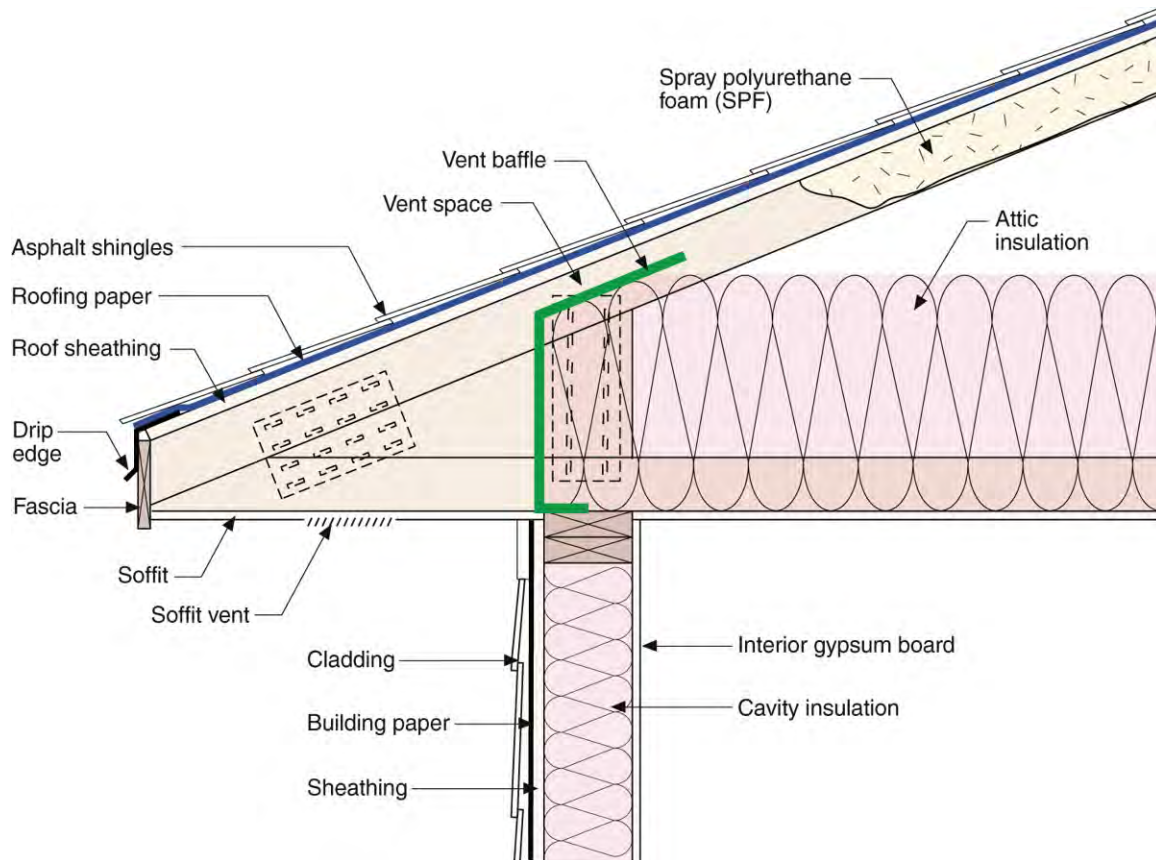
Vented Attic - Asphalt Shingles – Air Impermeable Insulation On Underside of Roof Deck - Can be used in all climate zones. In CEC Zone 16 (IECC Climate Zone 5 or higher) a Class II vapor retarder should be installed at the ceiling plane below the insulation. In all other climate zones a vapor retarder is not required. A ventilation ratio of 1:300 is recommended in all climate zones and is a basic code requirement in the IRC for vented attic assemblies. The roofing paper can be substituted with an impermeable fully adhered impermeable membrane with no apparent moisture risk. In this configuration – the attic space is vented - the vapor transmission characteristics of the SPF are not significant. Accordingly, either low density or high density SPF can be used in all climate zones including CEC Zone 16.
